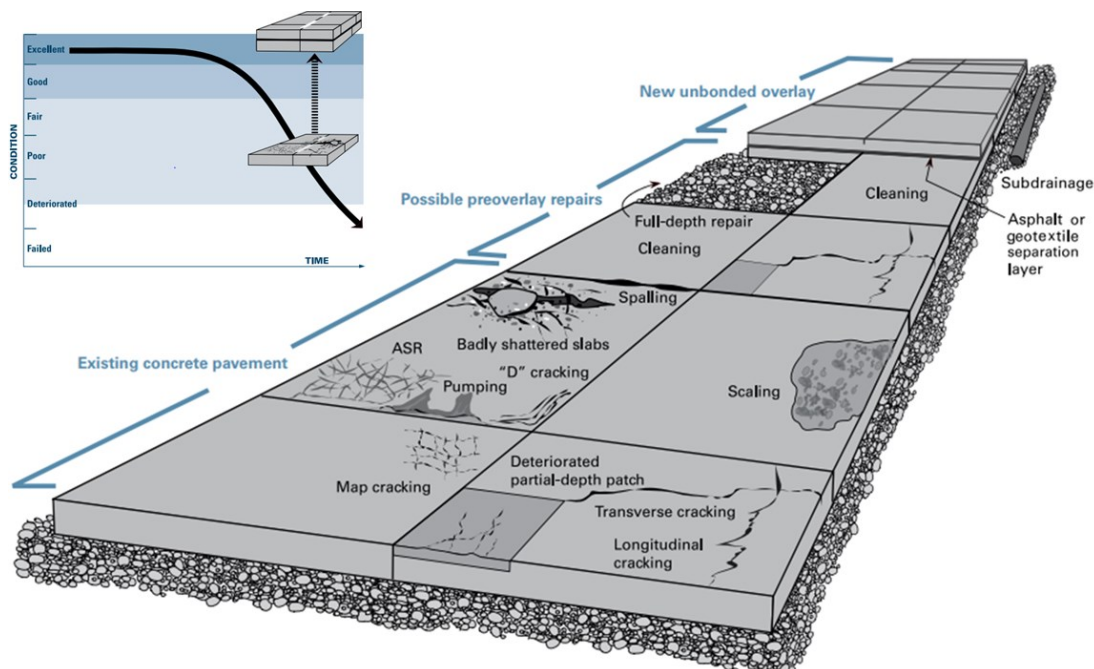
UBCOC of poor condition concrete pavement with surface distresses (Harrington et al. 2014)
